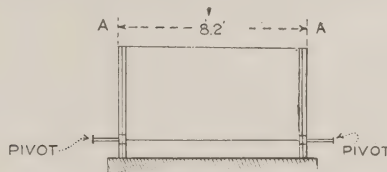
Device to prevent the explosion of grenades (longitudinal section).
